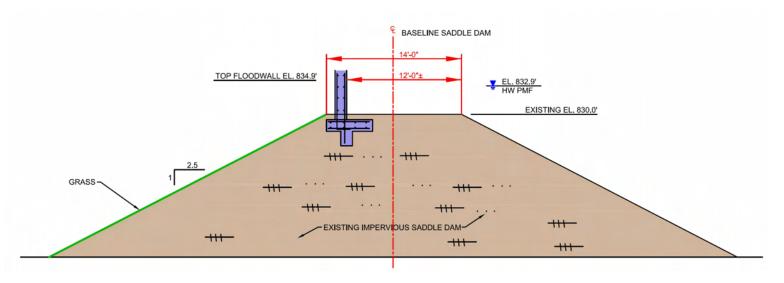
Tellico Dam – Concrete Floodwall Concept for Segment T-4 (Saddle Dam No. 3)
